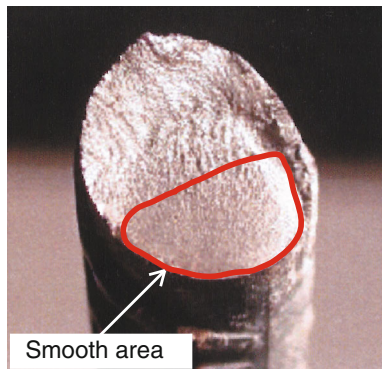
Fatigue fracture surface of a steel rebar [20]
